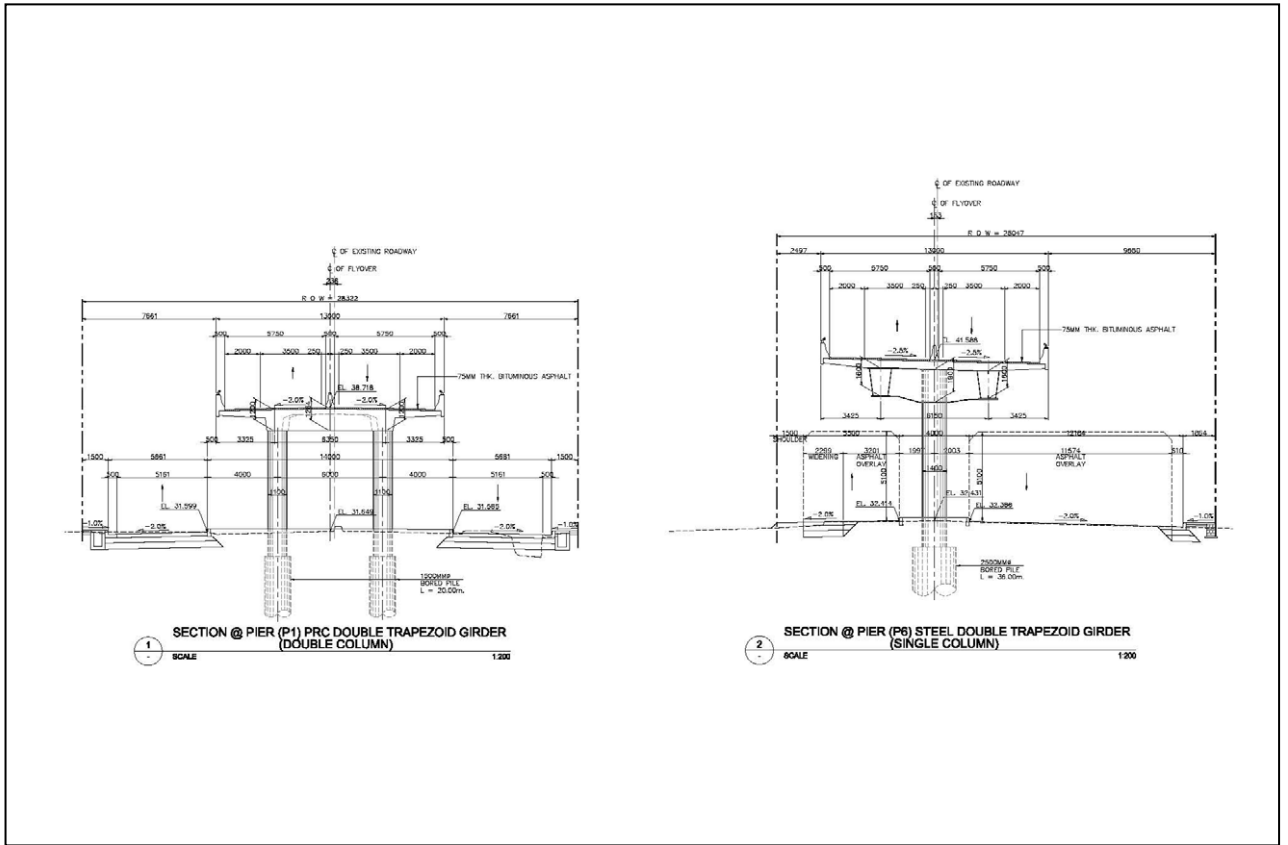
TYPICAL CROSS SECTION (PETERONGAN)
